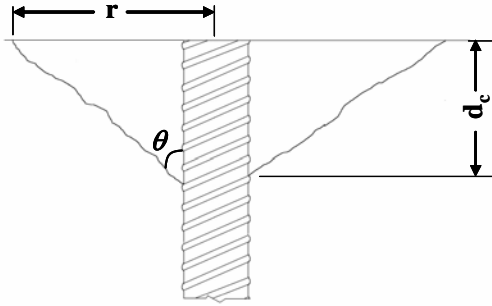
Cone-Shaped Break-Out in Concrete around Connector
